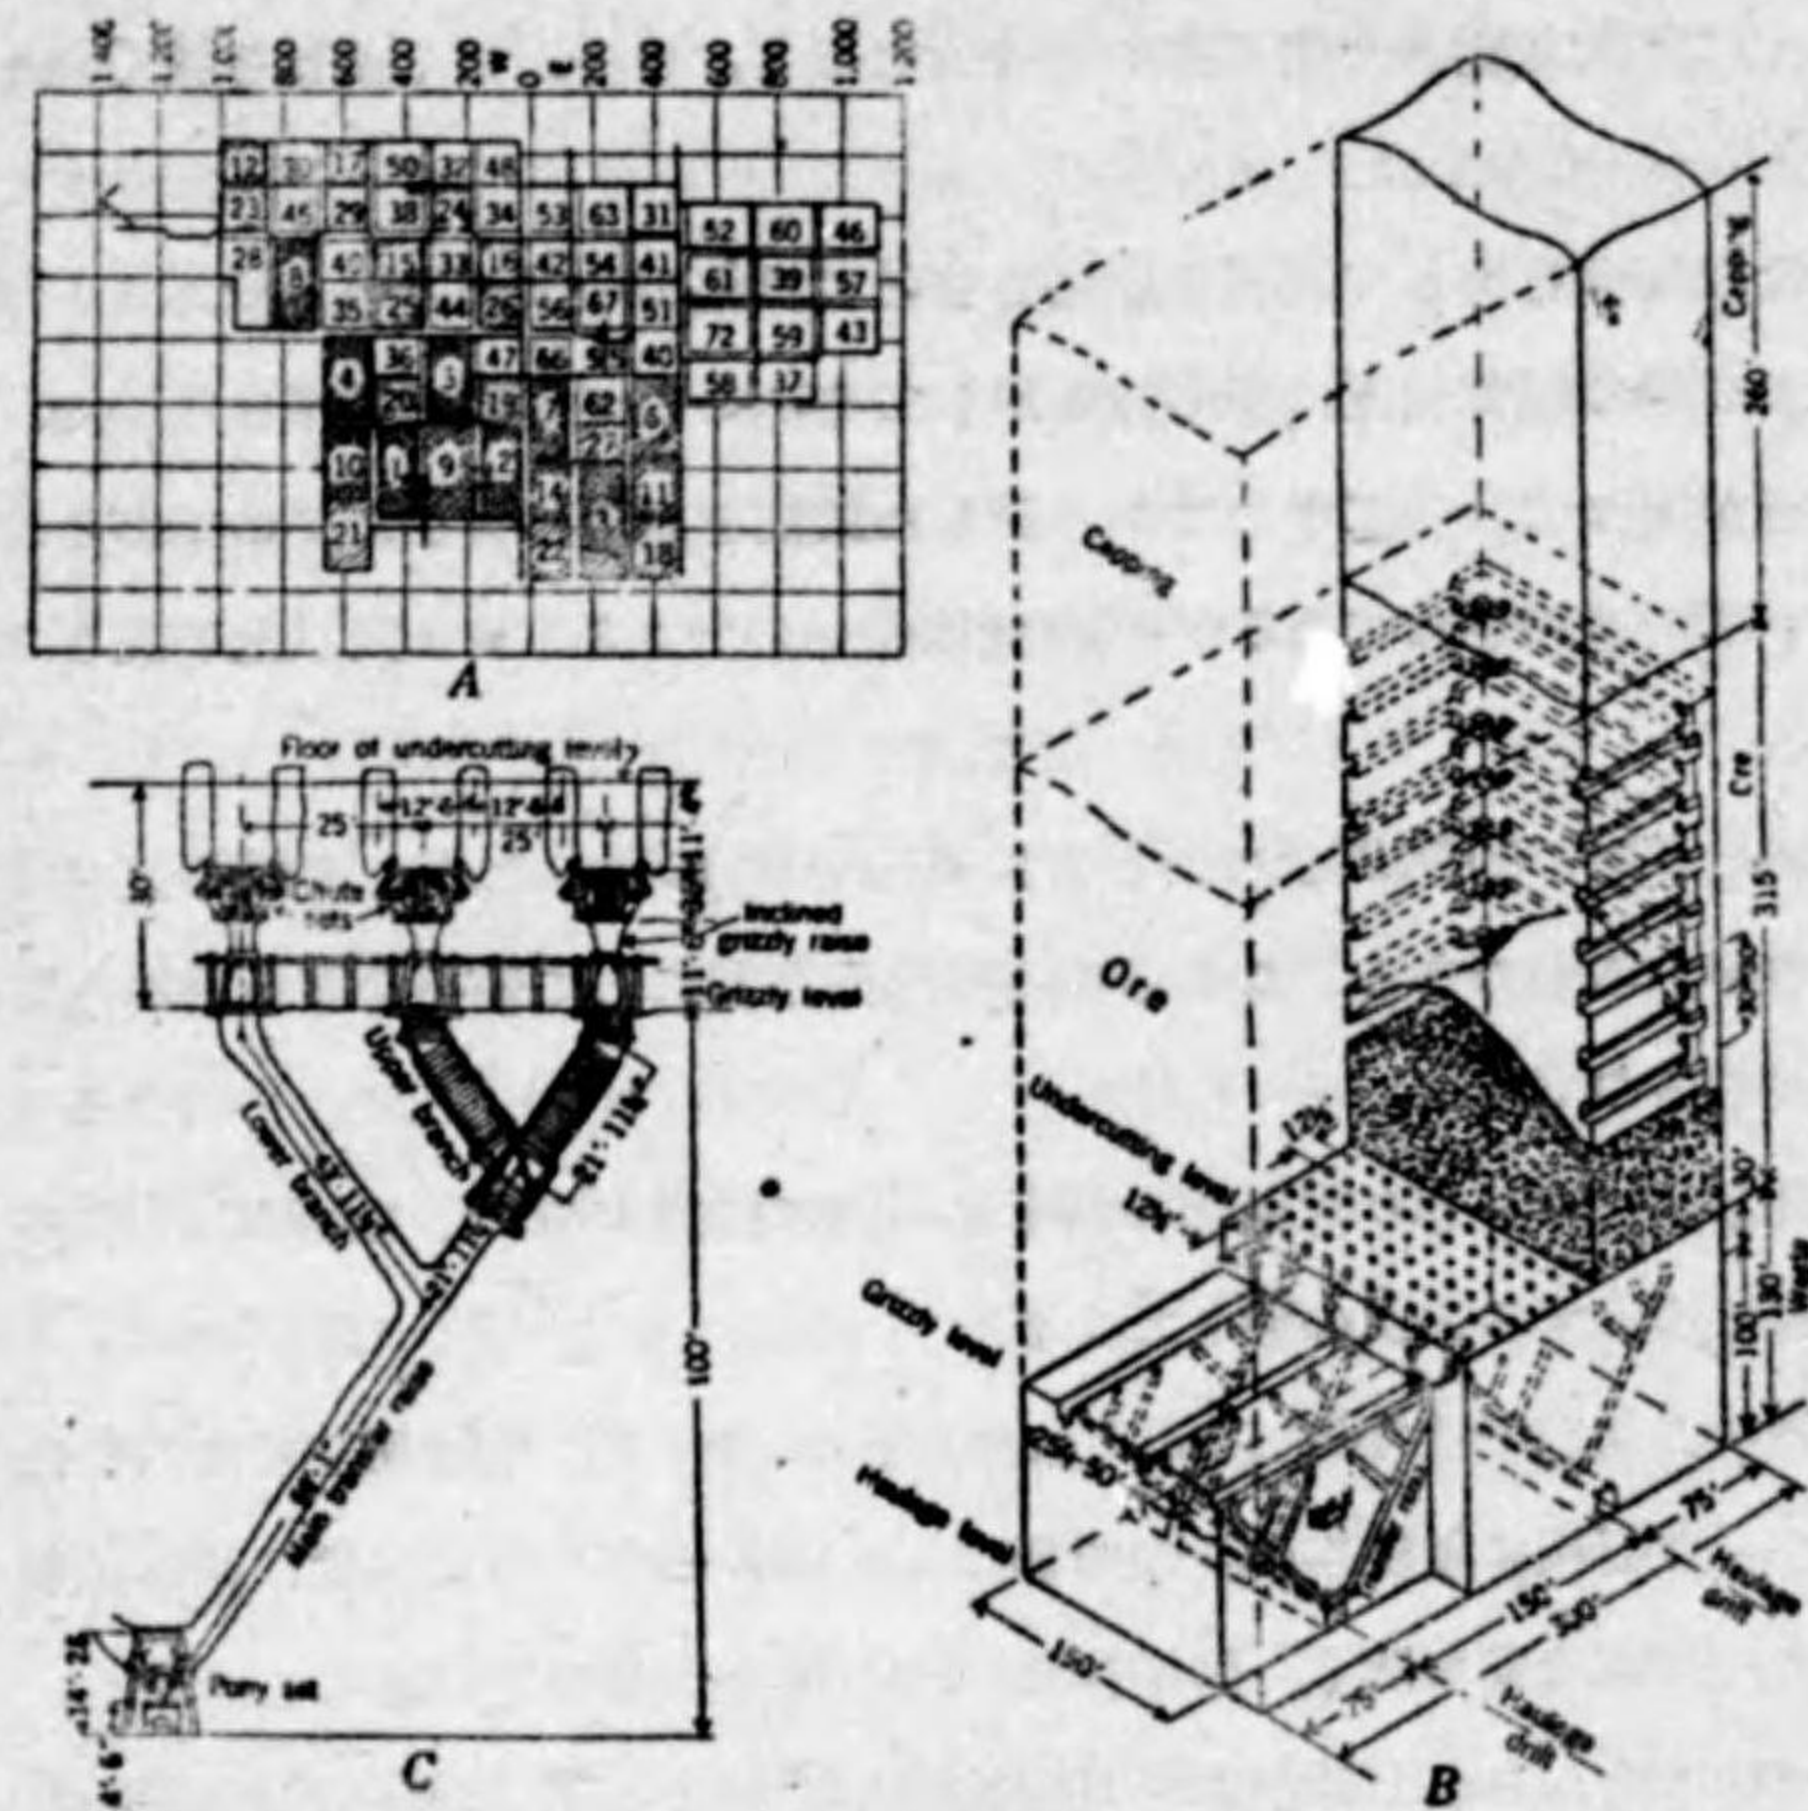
Undercut block caving, individual stope system, Miami mine, Arizona: A. Plan of 510-foot boundary caving level showing order of mining stopes; B. isometric drawing of 150-by-300-foot stope; C. detail of ore transfer raise system,
